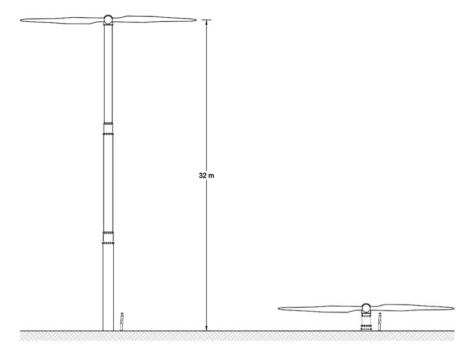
Telescopic tower: a tower extended; b tower retracted
